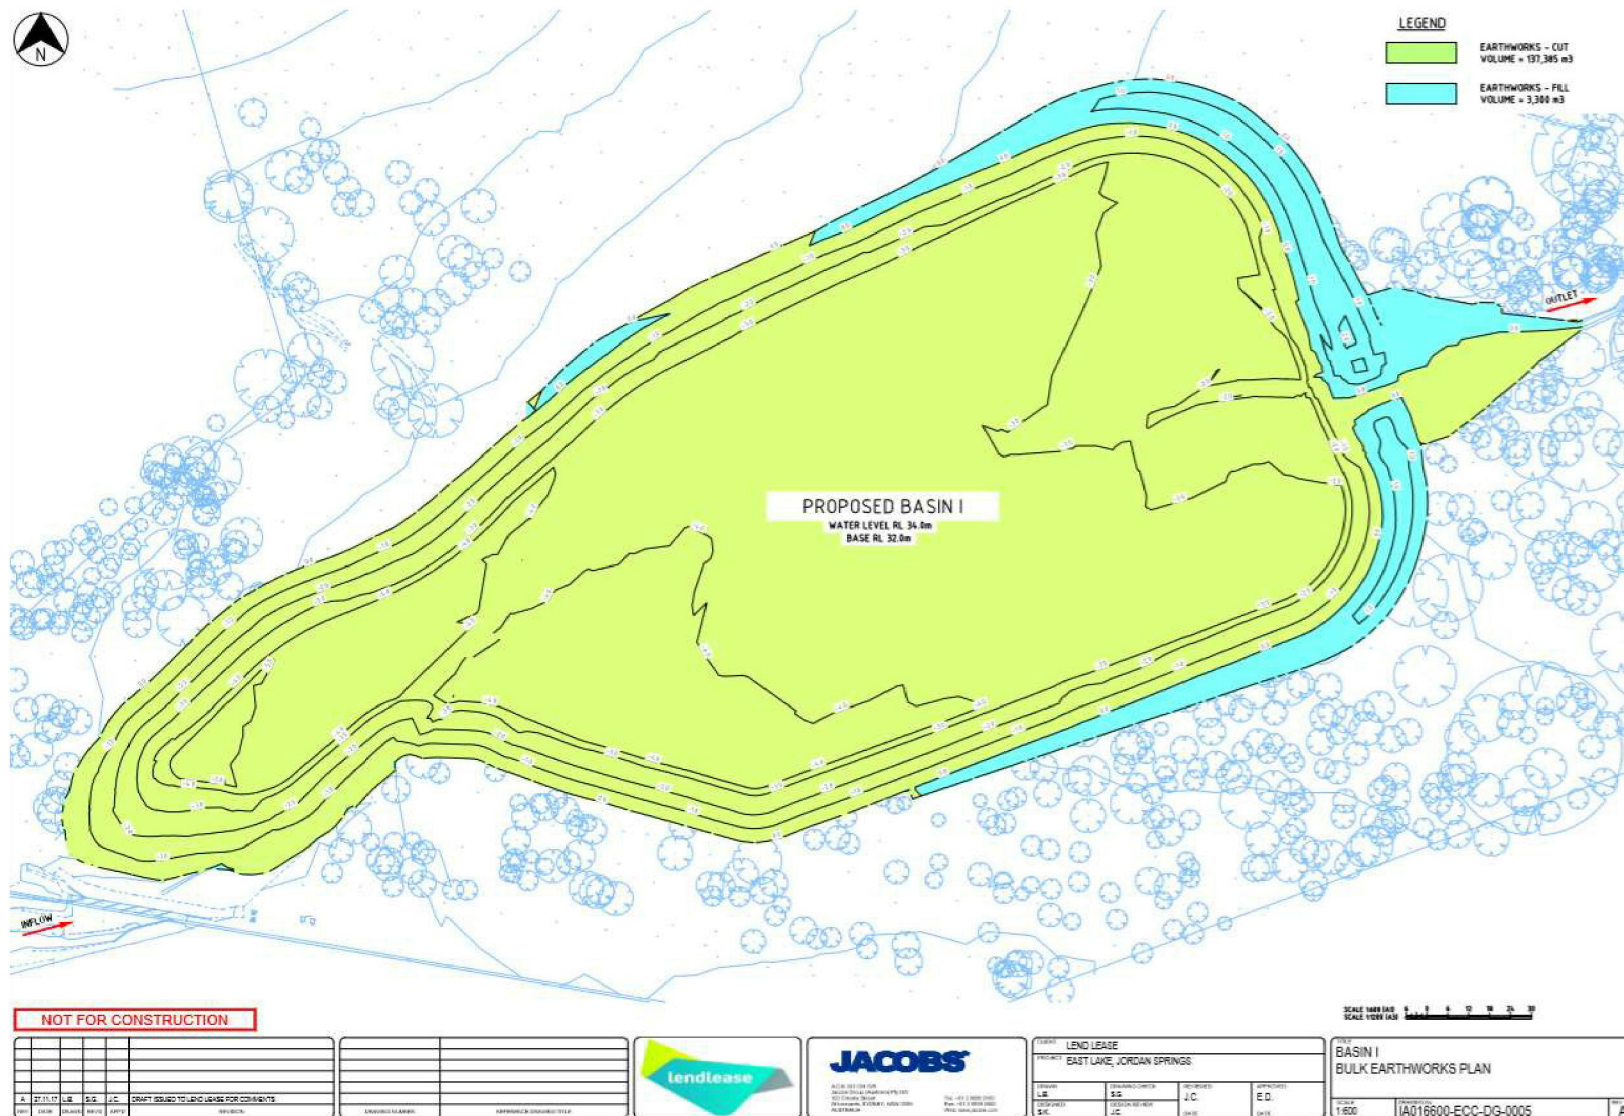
Proposed Basin I earthworks plan (Source: Jacobs)
